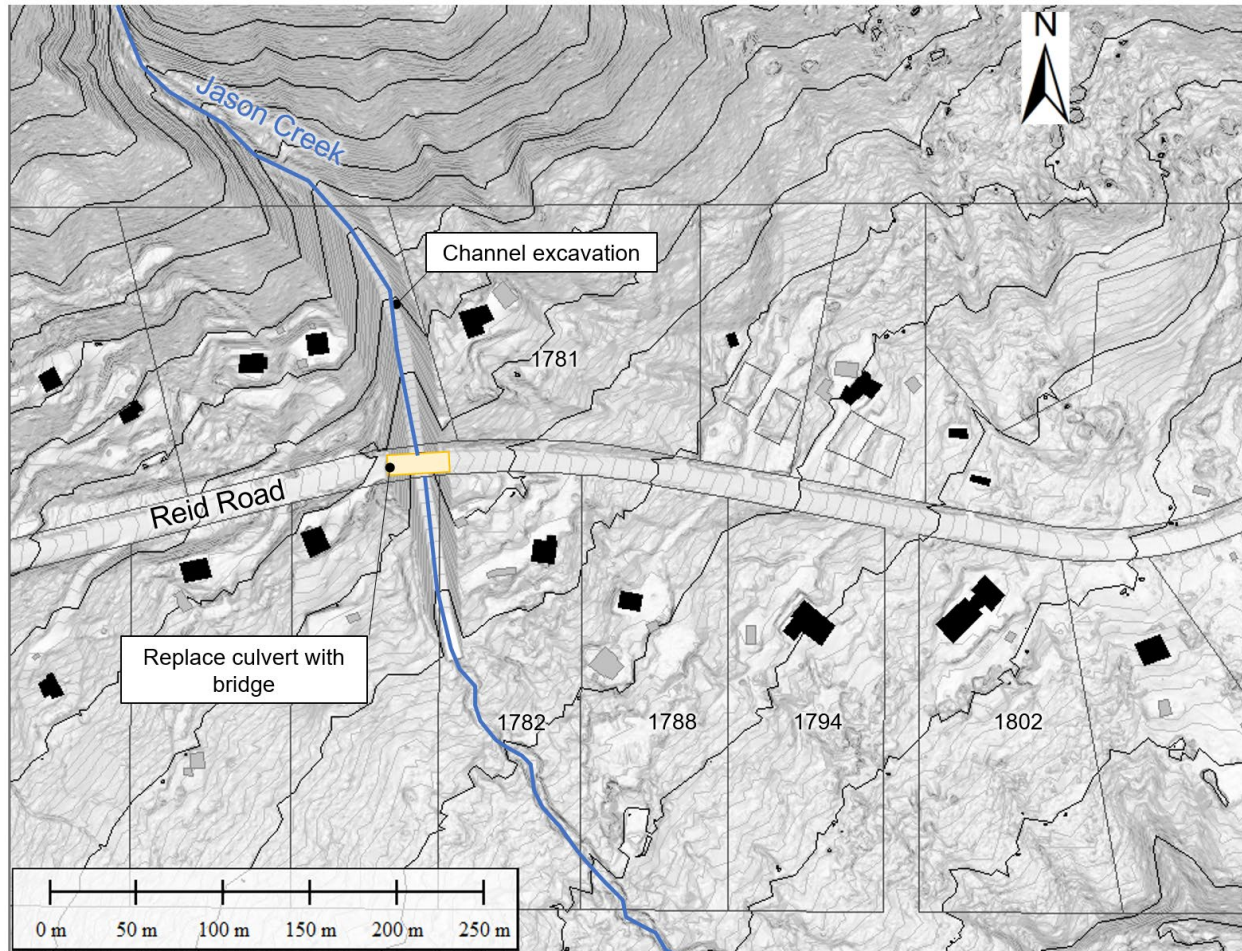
Conceptual layout of channel excavation and bridge replacement.
